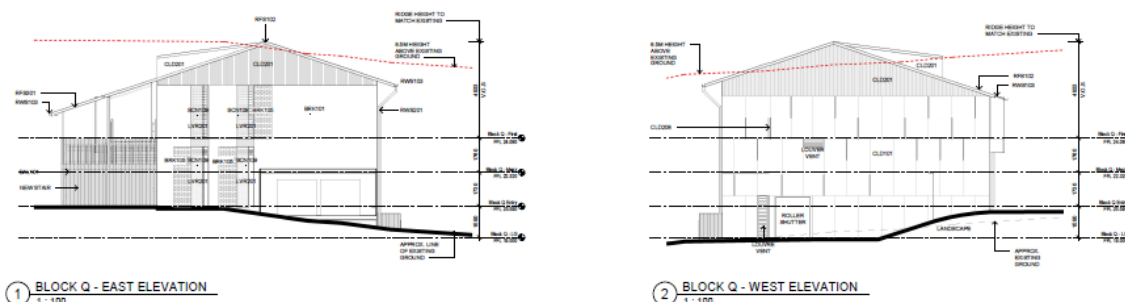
Extract of Cross Section – Building Q (prepared by NBR Architecture)
